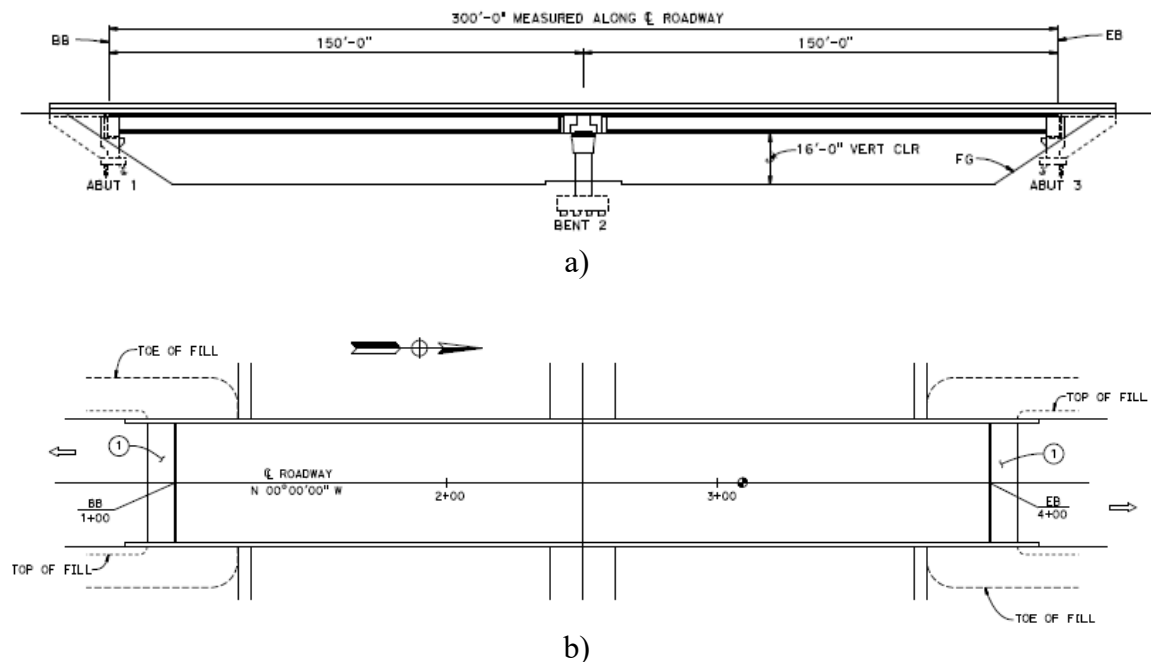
Schematic of OSB3 (drawings provided by Caltrans): (a) Elevation view; (b) Plan view
